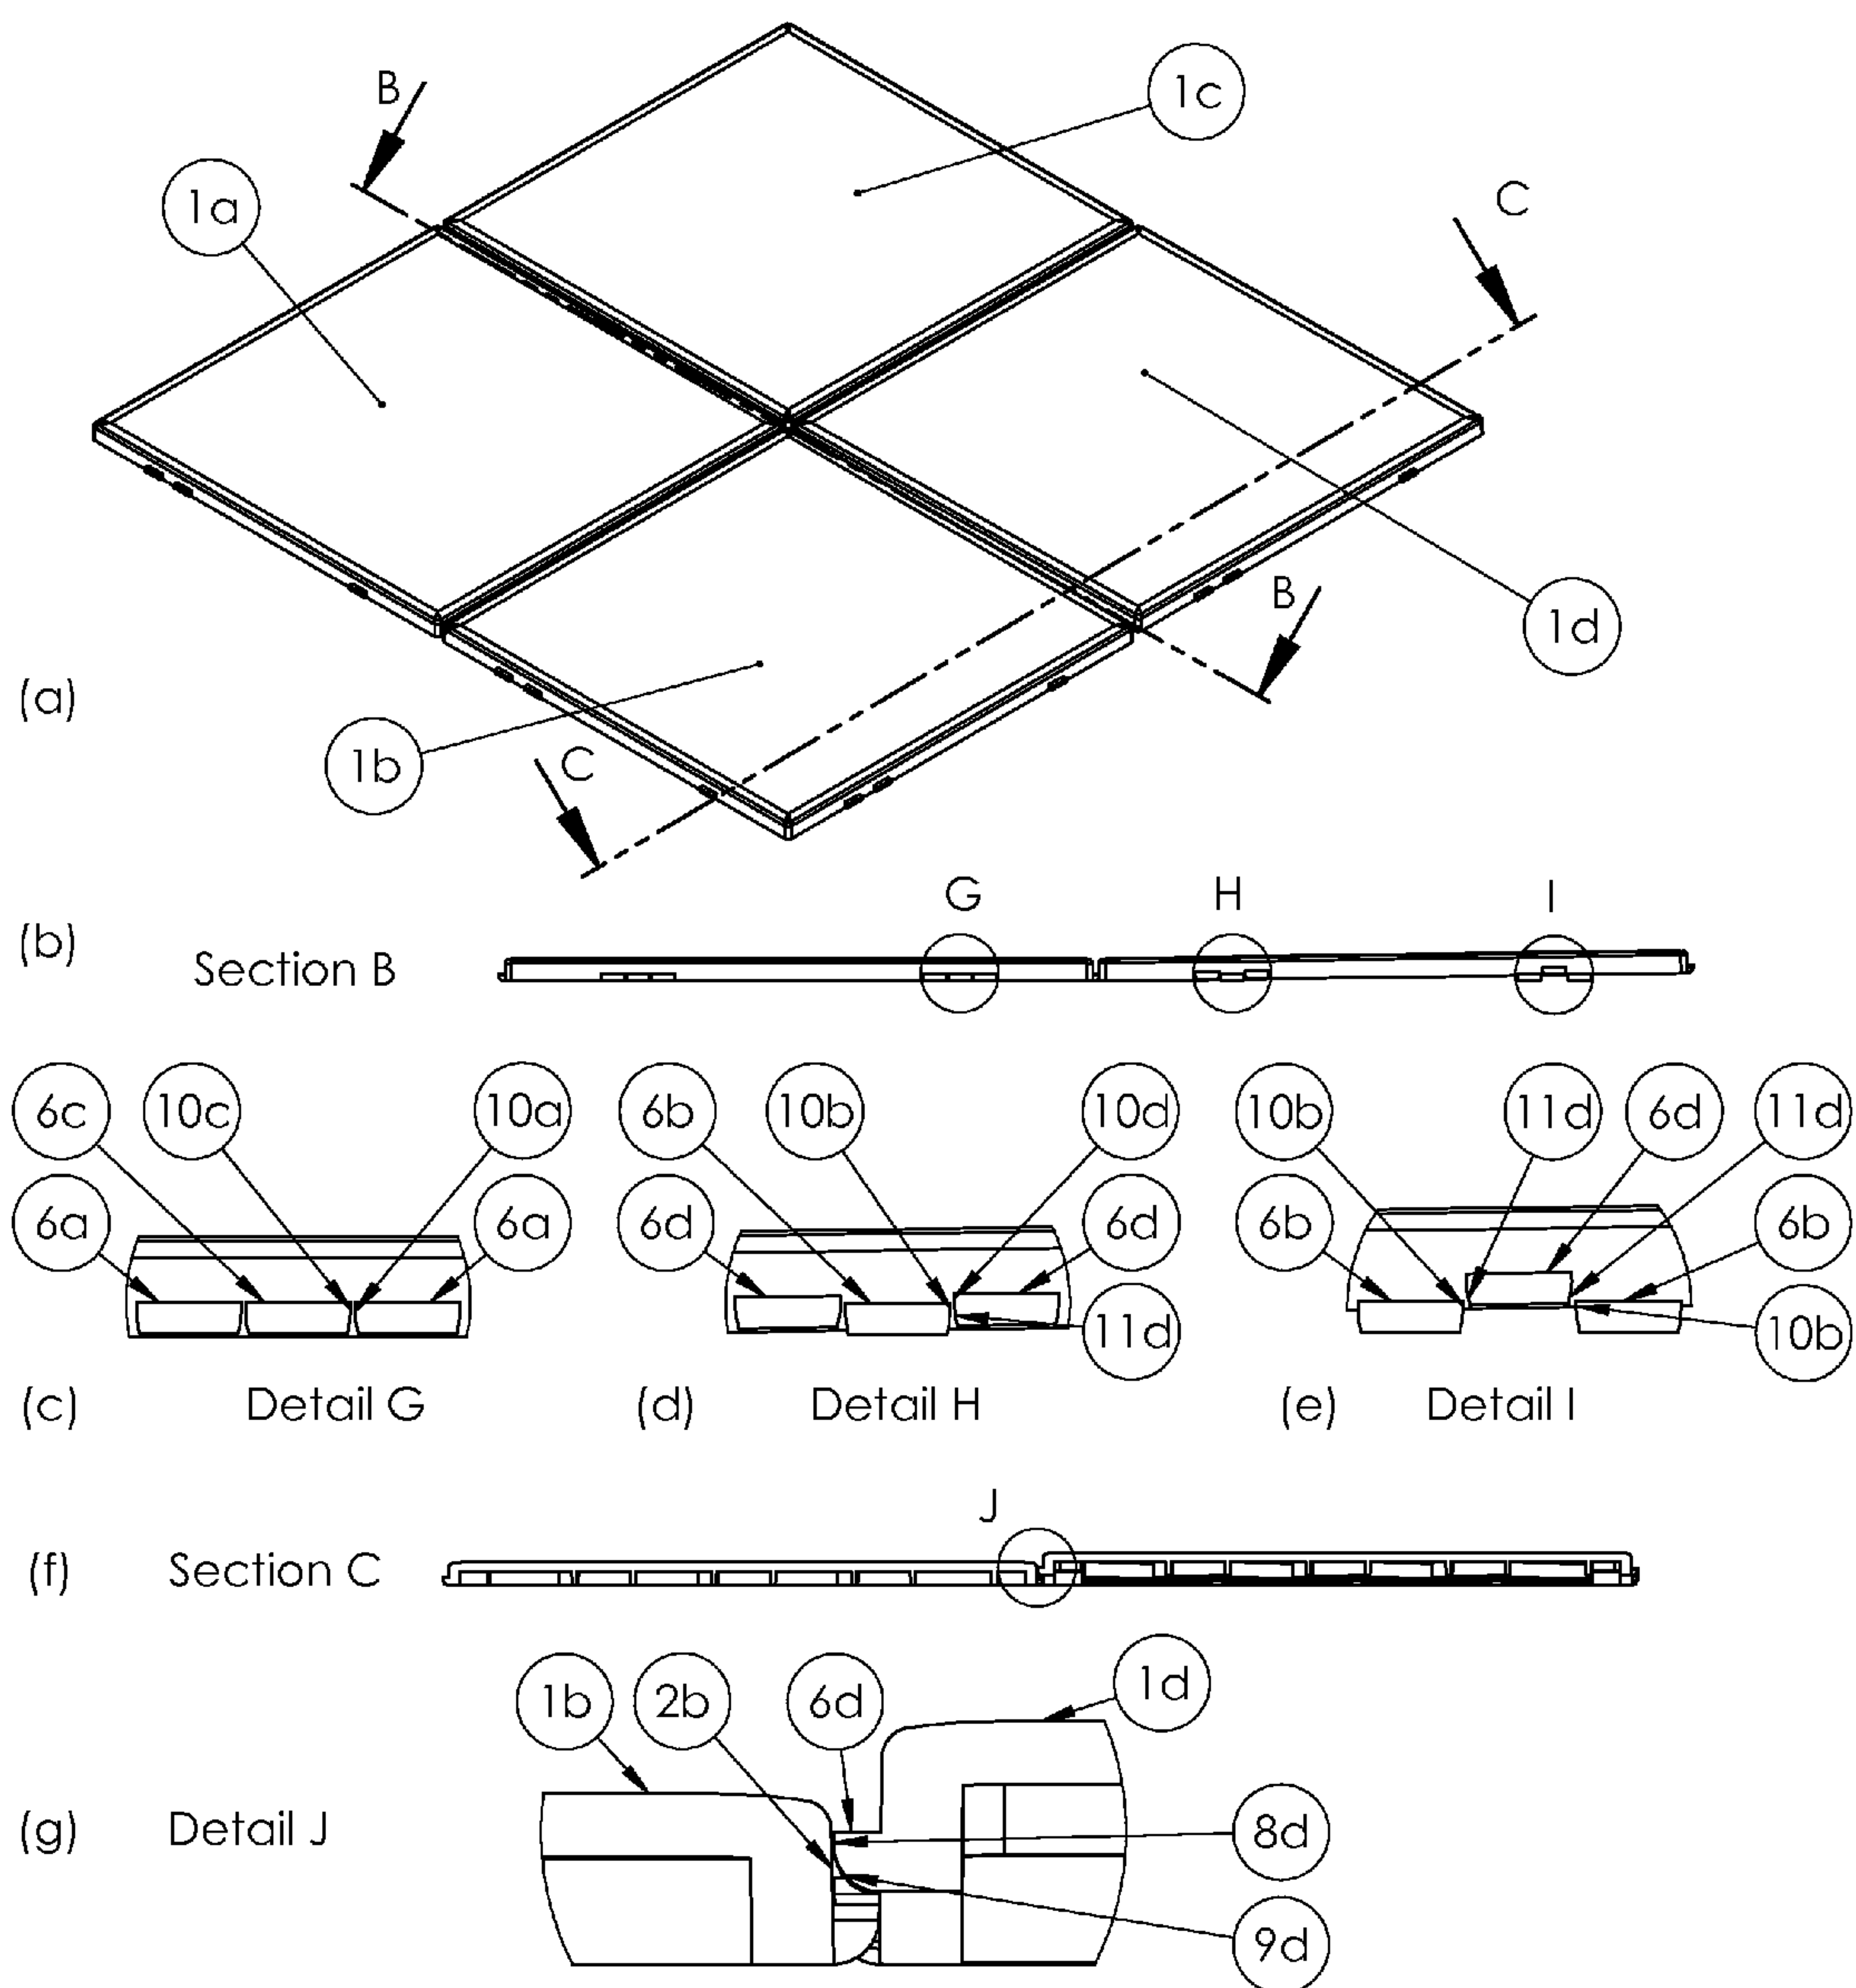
(a) Isometric View of Square Tiles being laid in Straight-Laid Pattern with 4th Tile almost installed, (b) Section B, (c) Detail G, (d) Detail H, (e) Detail I, (f) Section C, and (g) Detail J
